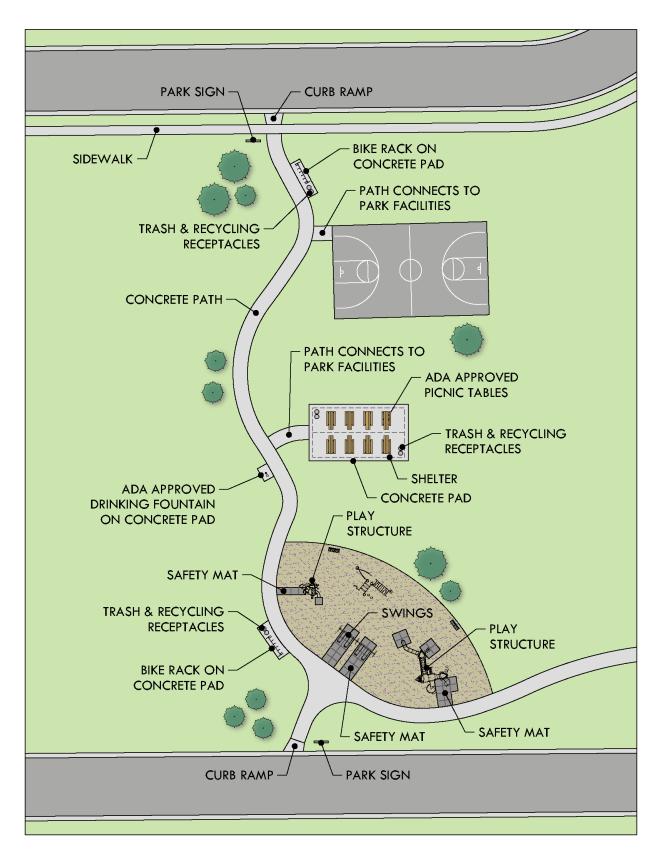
Typical ADA requirements call for barrier free access to all park facilities. Hardscape paths, playground safety mats and ADA approved support components are examples of good practices when designing parks for accessibility. Other examples of necessary elements for general park design include bicycle parking, trash/recycling receptacles and a park sign.
